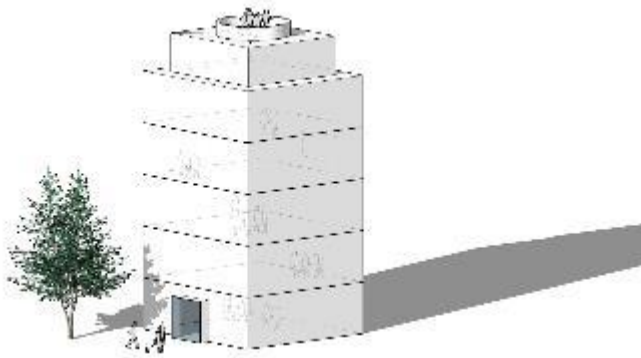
Façade As An Envelope Or “Skin” To A Building (Courtesy: AgFacadesign & G Facadesign Pte Ltd)
